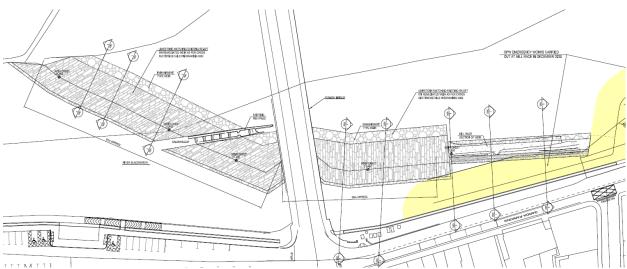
Proposed Re-constructed Fermoy Weir Plan – extract from drawing no. 19011-TJOC-PL-XX-DR-C-0060
